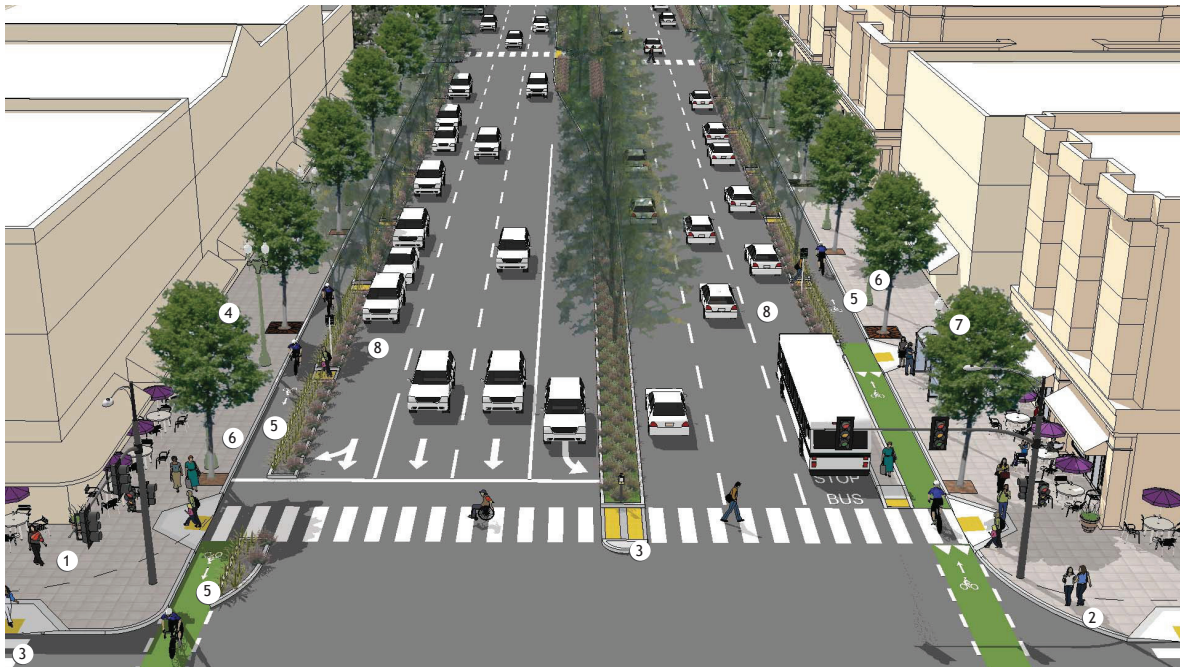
WINCHESTER BOULEVARD EXISTING - 100 FOOT CURB-TO-CURB WIDTH
